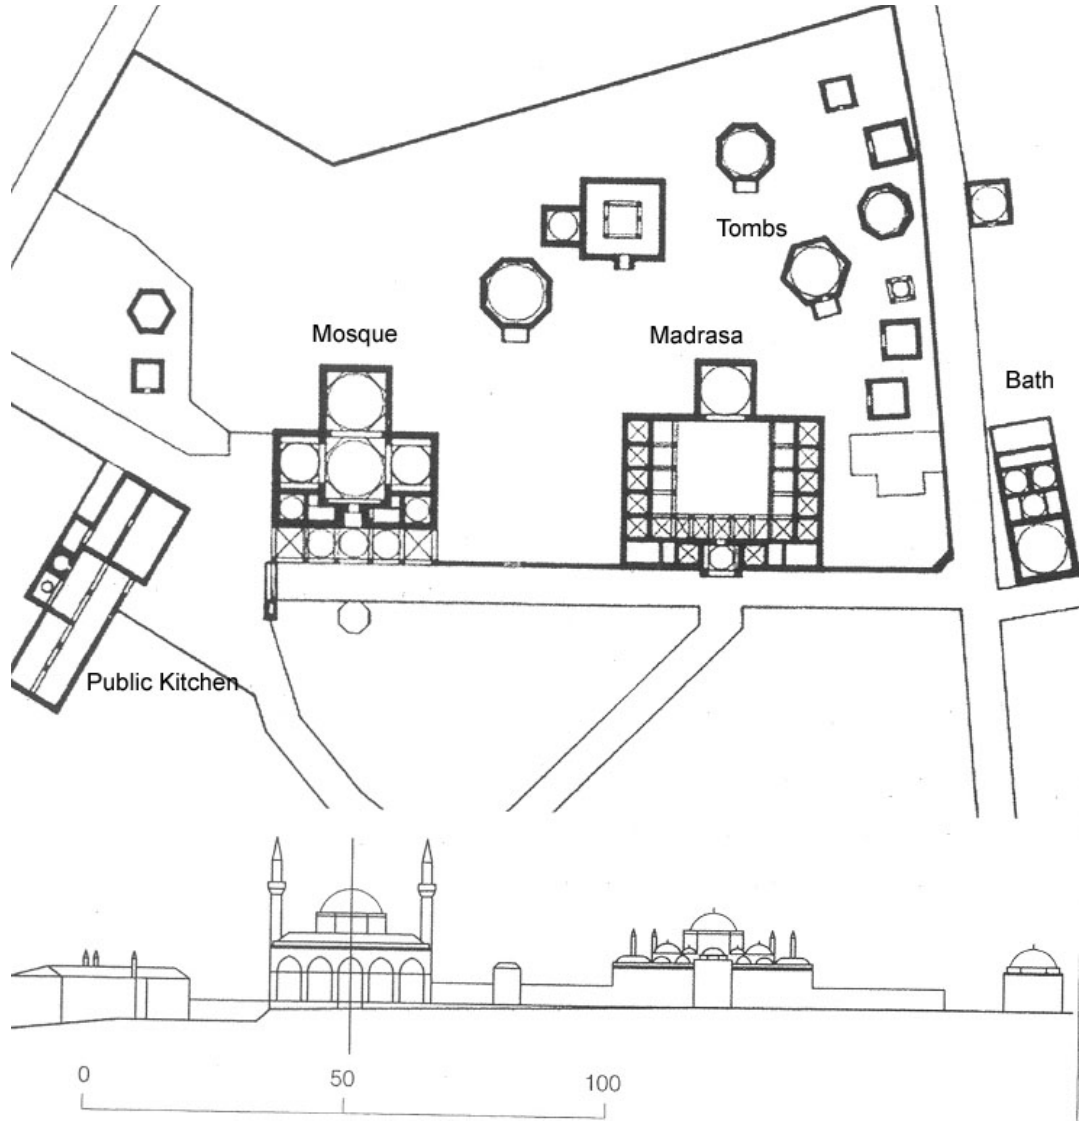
13 Site Plan and Elevation of Murad II (Muradiye) Complex in Bursa (1425)
